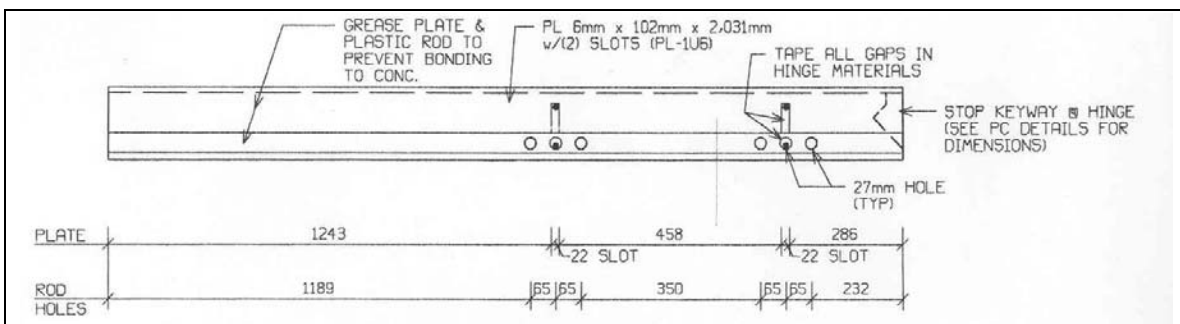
NU-Deck end panel hinge section (NDOR, 2003)
